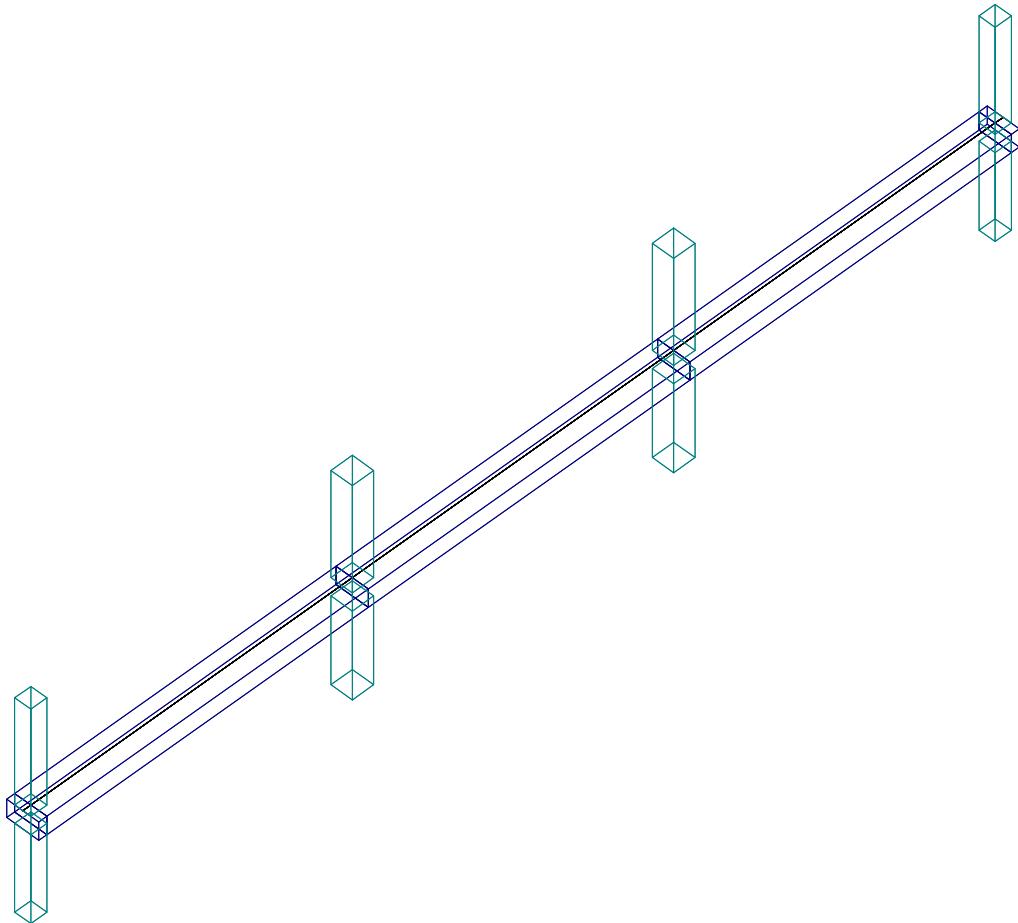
Isometric View of Typical One-Way Joist Floor System
